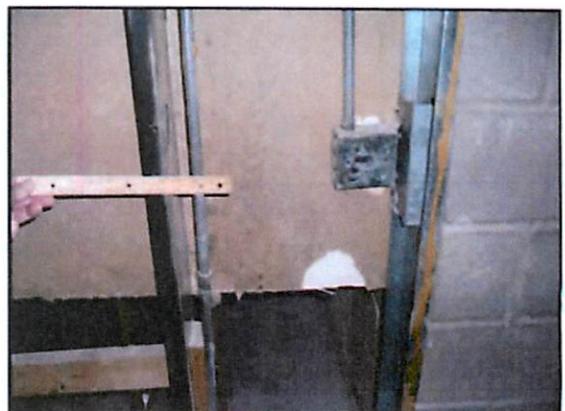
North wing Room 3 wall system common with east restroom, minor fungal growth on exposed interstitial wall board
